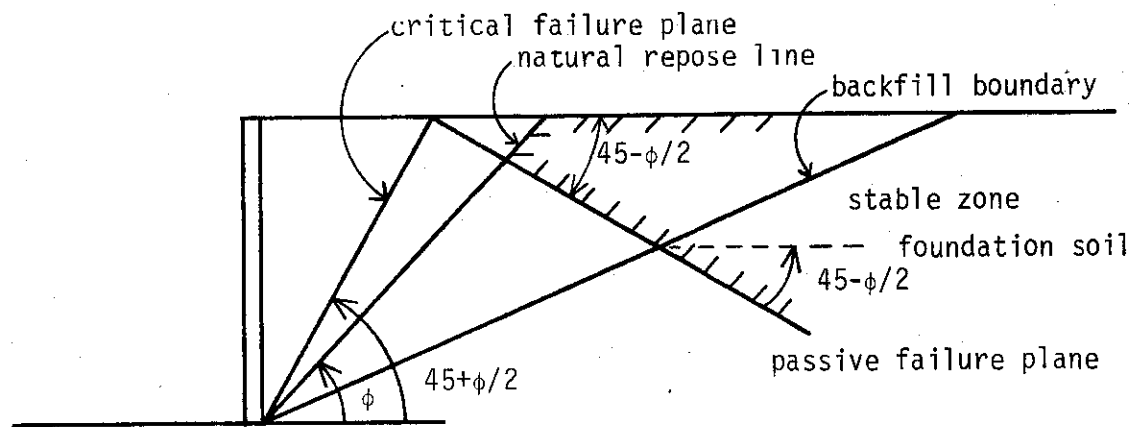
Stable Zone of Drilled-In Concrete Anchor
